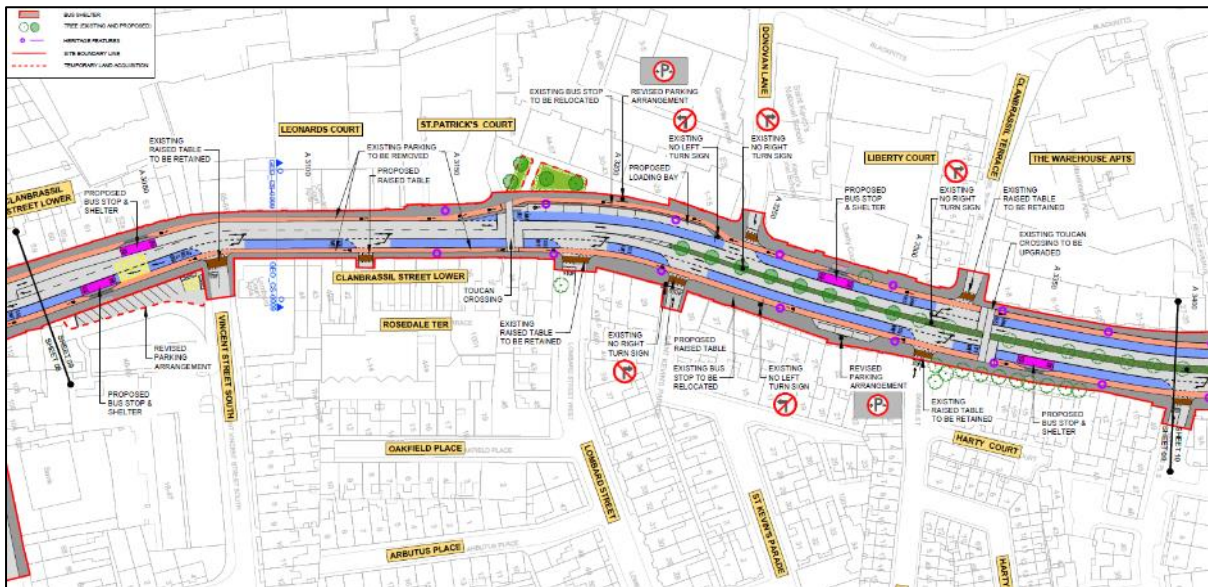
Extract from General Arrangement Drawings (Sheet 9)
